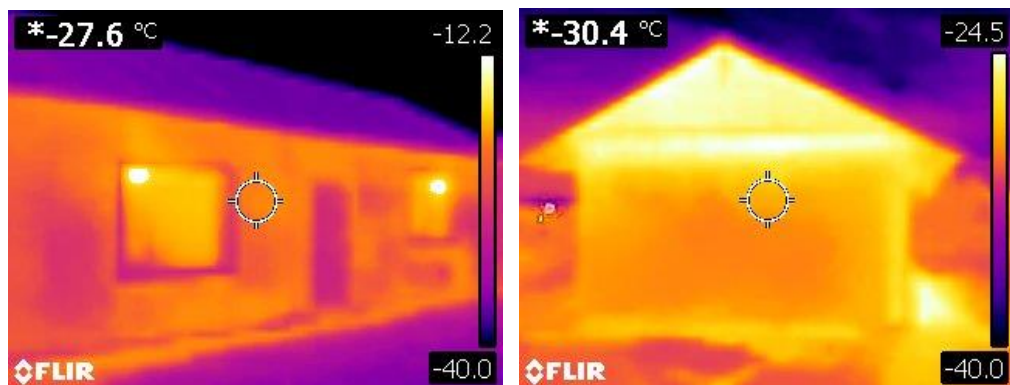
Thermal image of south wall (right) and west end wall (left).
